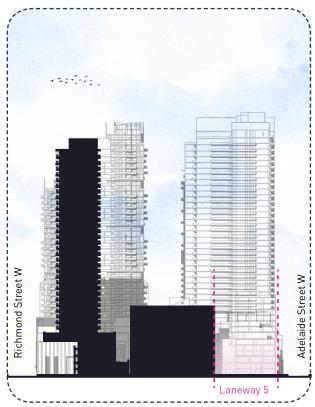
Enlarged Site Section B.B; 1:1,800 2006-2013, section
